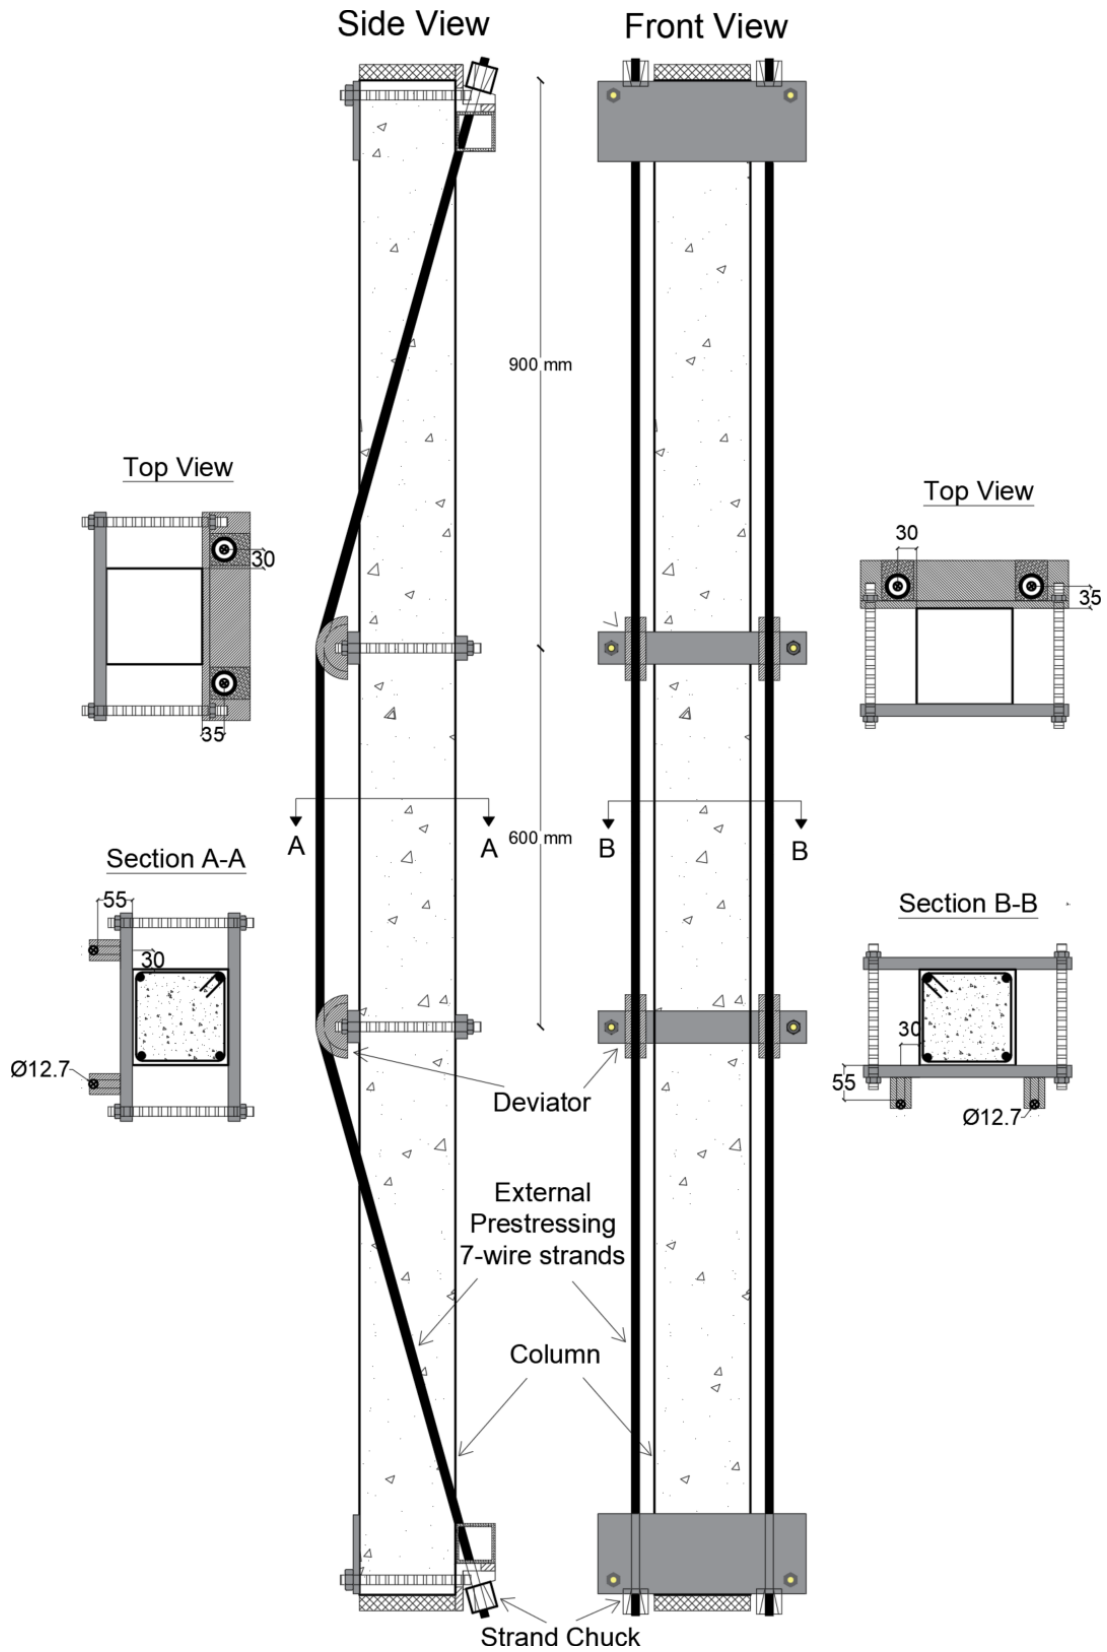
Column with two external prestressing strands having a double-harped profile.
